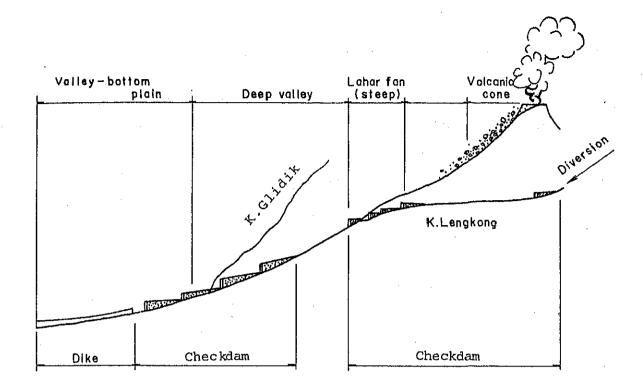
Schematic Drawing of Sediment Control Facilities Plan in K. Glidik
